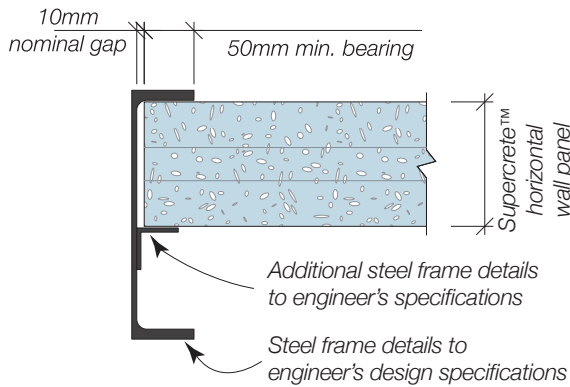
Horizontal wall panel & steel support - splay corner junction detail.
